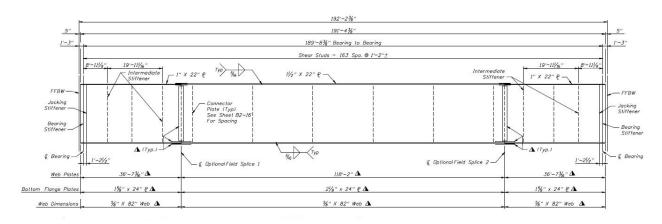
Typical details of girders of the I-95 Bridge over SR-421
